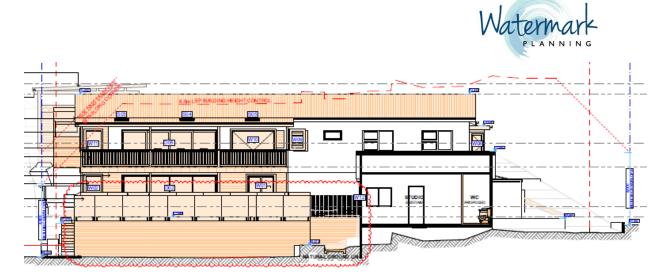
Extract of Proposed South / West Elevation (MOD09) – area to be modified shown in red bubble
